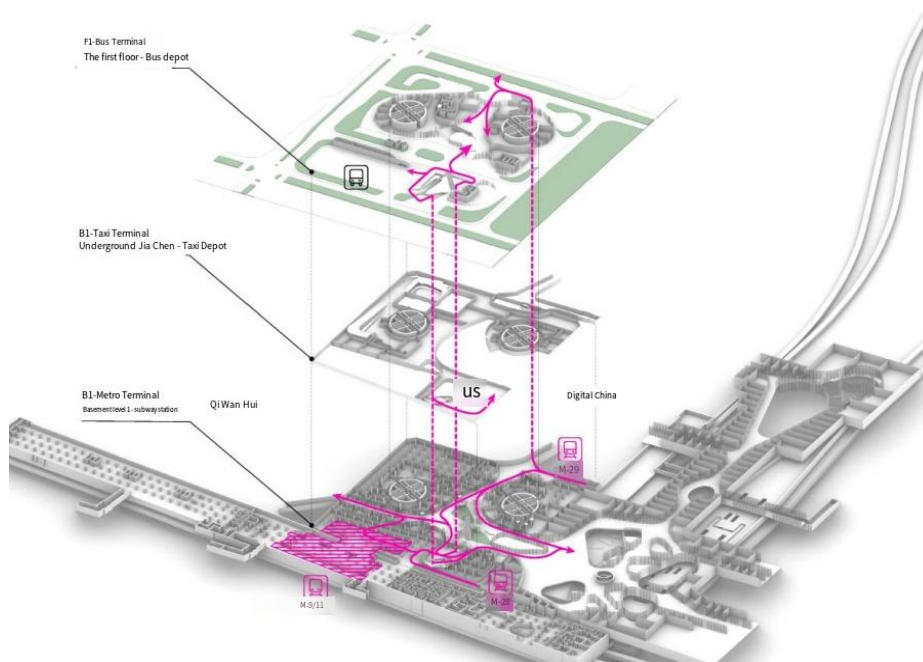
Schematic diagram of the first floor and B1 floor of Tower C.
